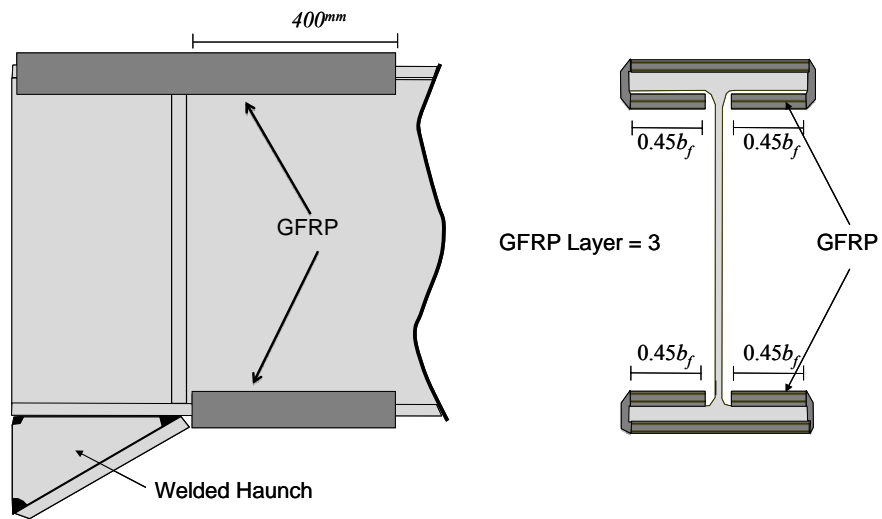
GFRP Layout of HE400AA GFRP3 Beam
